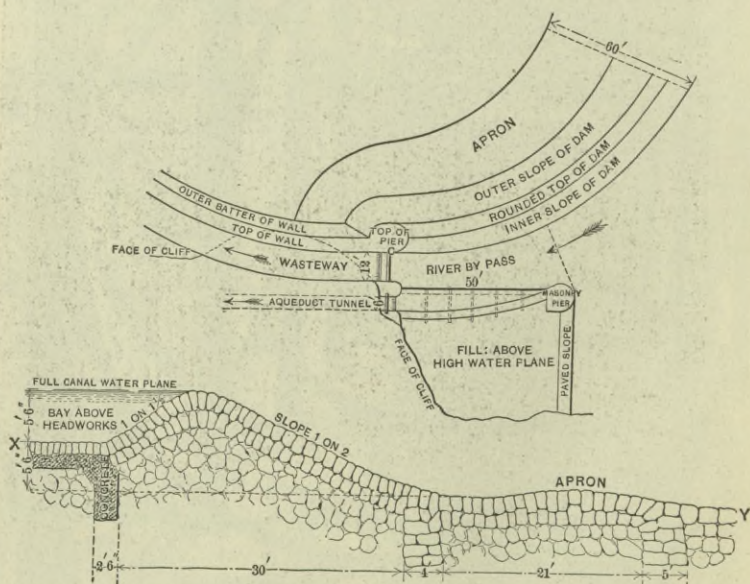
PLAN OF HEADWORKS AND CROSS-SECTION OF DIVERSION WEIR, SANTA ANA CANAL.
